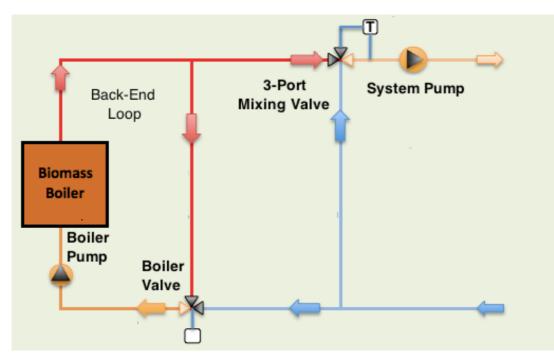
Biomass Boiler with Back-End Valve and a Three Port Mixing Valve
